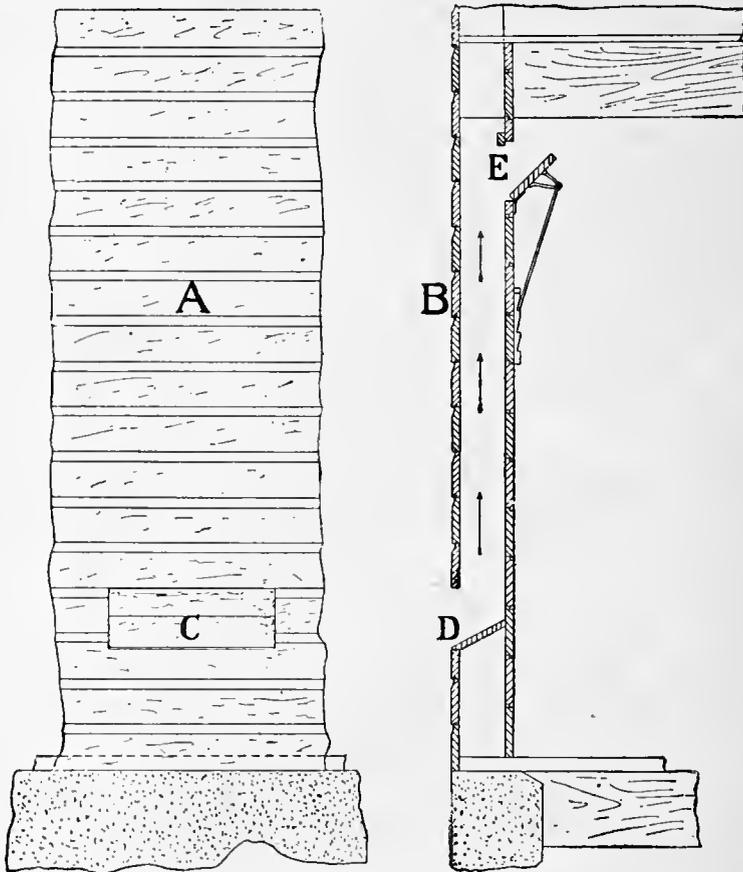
A wall section of a stable constructed of wood. The exterior A, shows the opening at C. The cross section B, shows the method of constructing the fresh-air intake. The outside opening is shown at D and the inside at E. A simple but effective valve to regulate the supply of fresh air is also shown at E.
